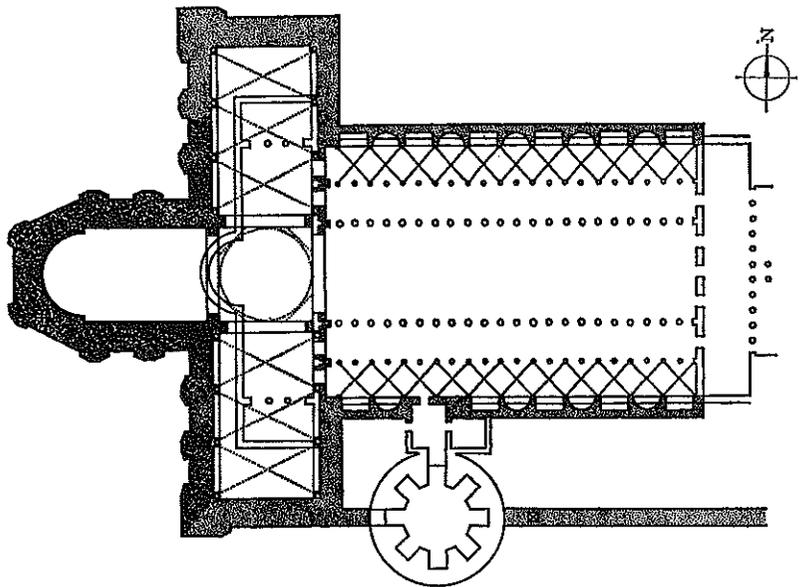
Plan of Saint Peter's (after Krautheimer).
